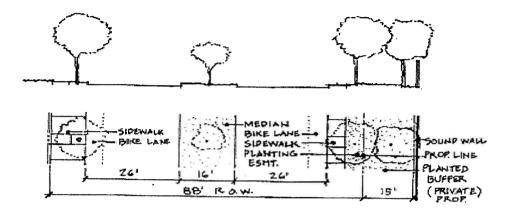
Street Section. Countryside Drive between Monte Vista Avenue and Tuolumne Road
